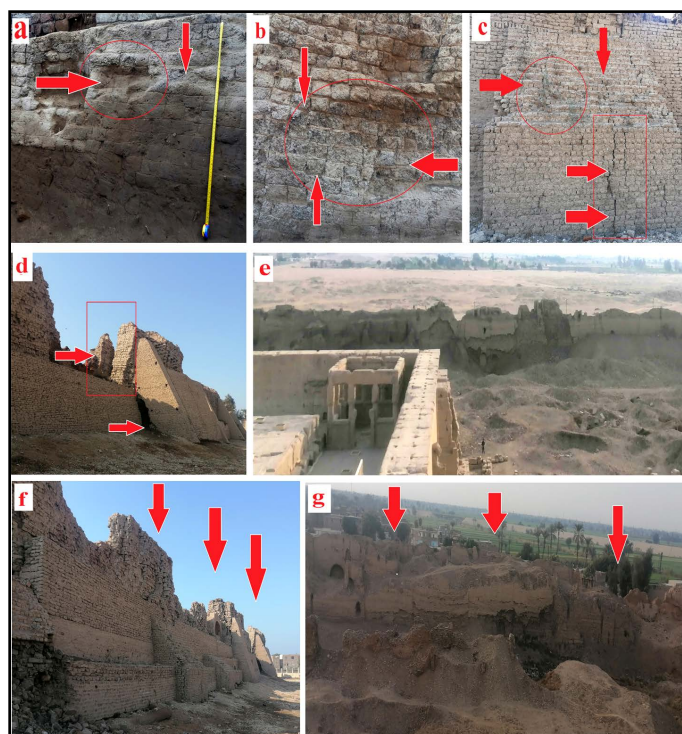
(a) Swelling of brick blocks due to the effect of ground water. (b) Erosion and loss in adobe blocks. (c) Cracks and separation in the mud brick blocks used in the reinforcement process. (d) Separation of the mud brick blocks used in the wall as well as separation of the mud brick blocks used in the reinforcement. (e) The southwestern side of the wall. (f) The northwestern side of the wall.
